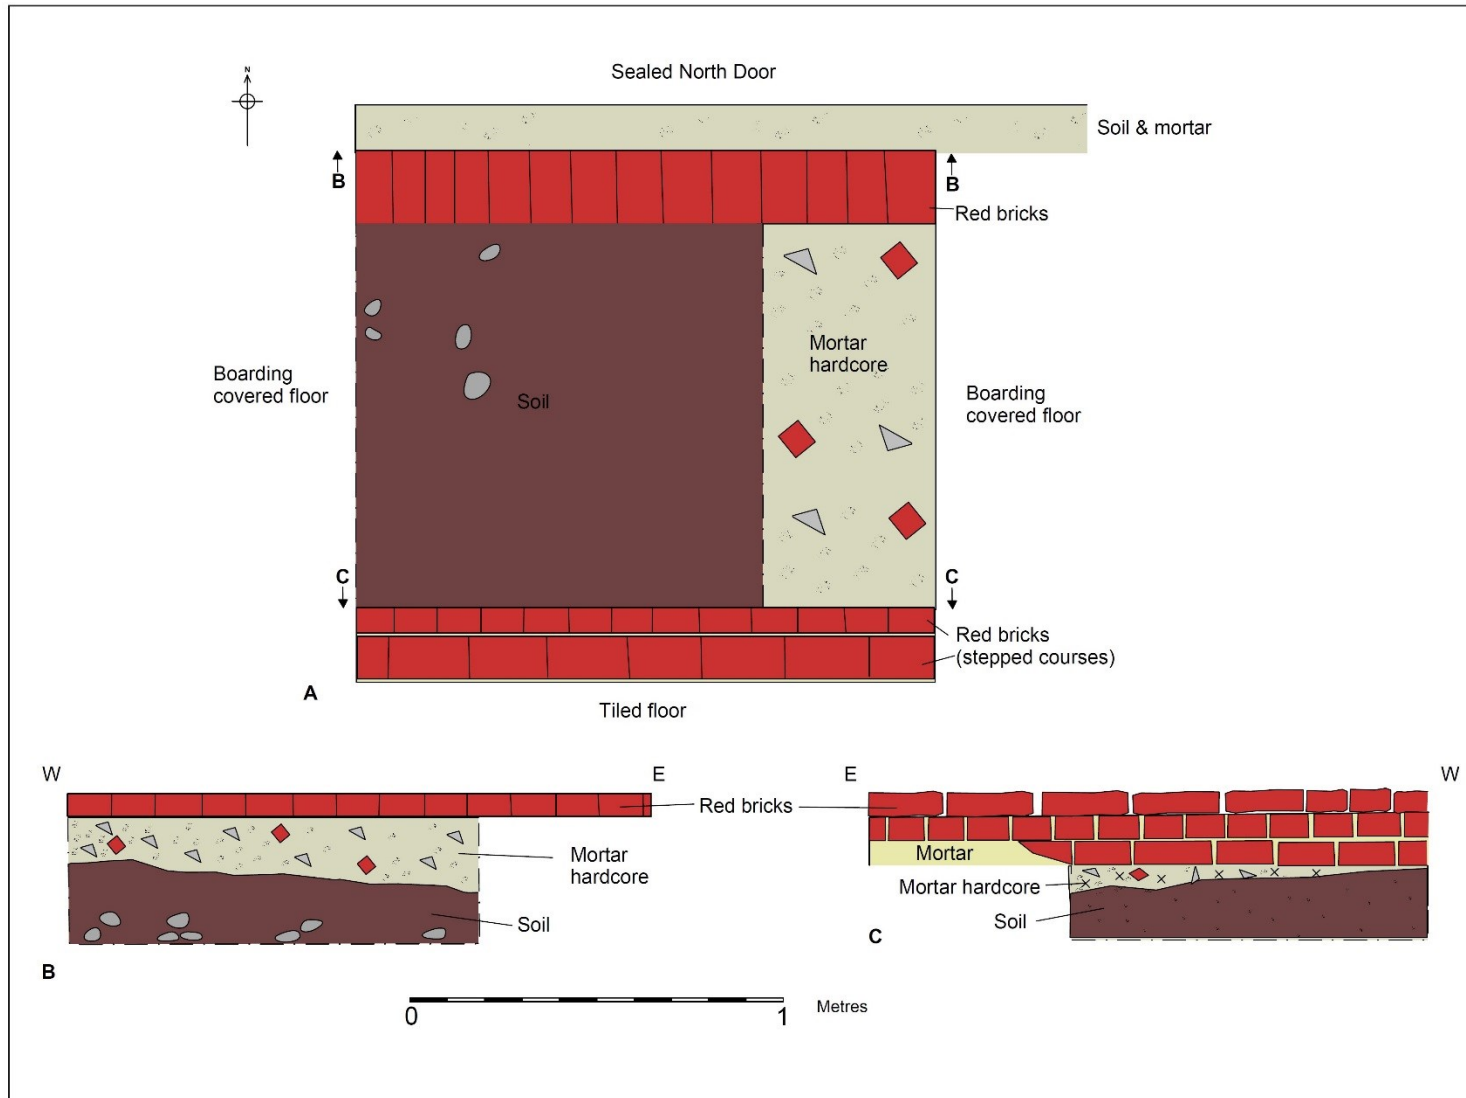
A. Post excavation plan of T.P 03. B. South facing section. C. North facing section
